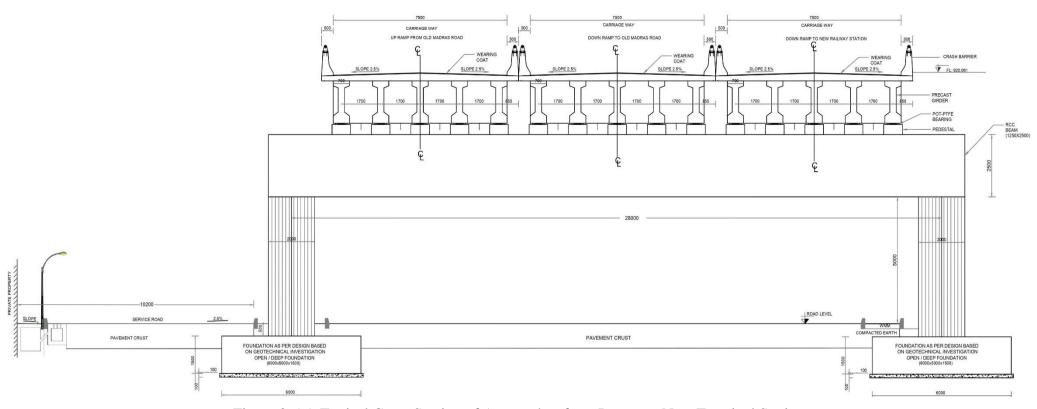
A Typical Cross Section of Approaches from Rotary to New Terminal Station
